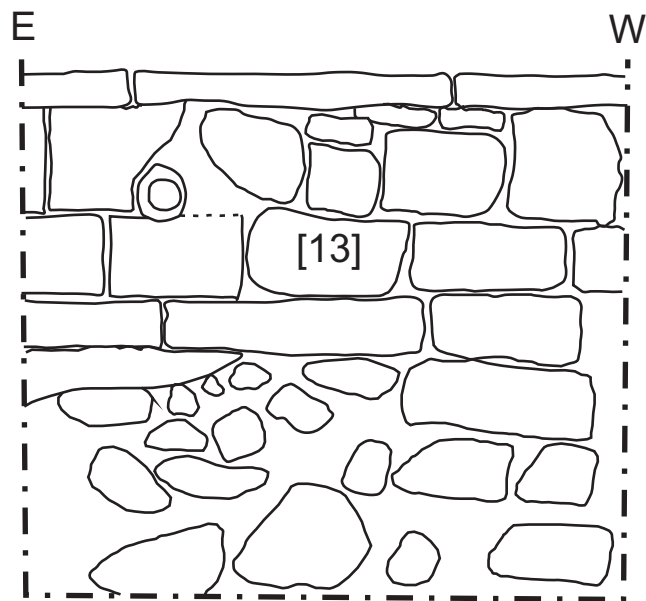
Elevation of wall 13 within north-facing section of pump chamber pit
